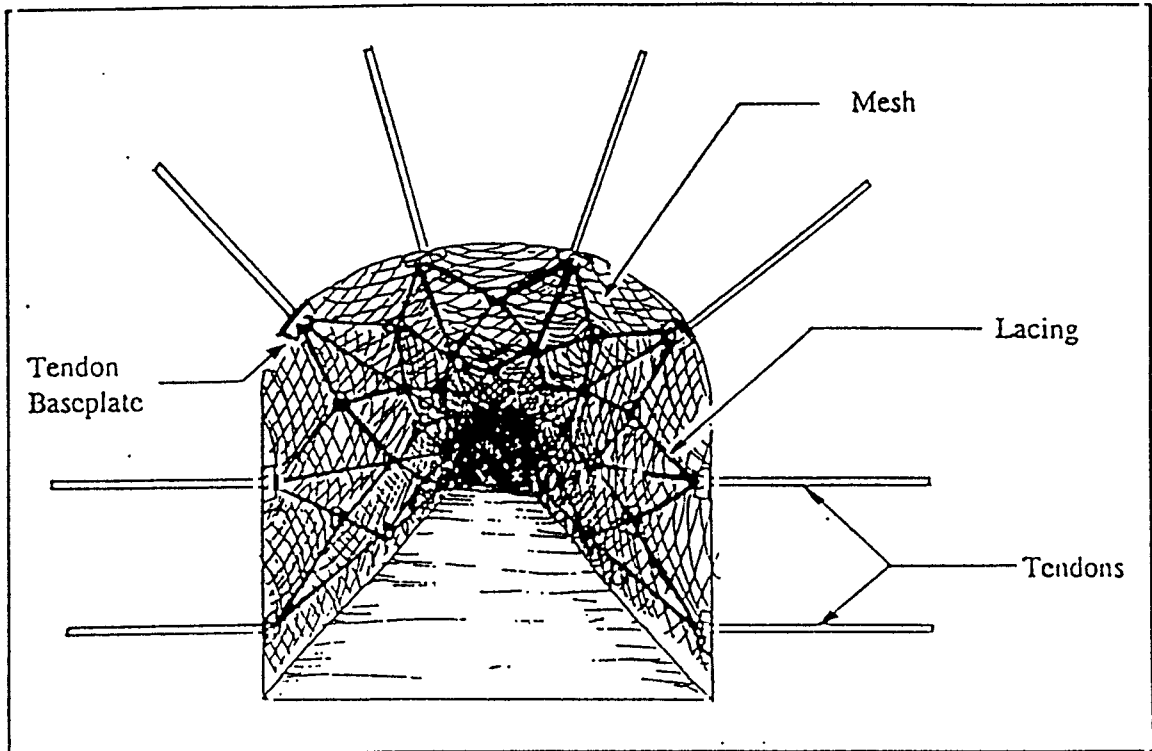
Perspective view of a tunnel illustrating typical reinforcement and support elements (after Roberts [1]).
